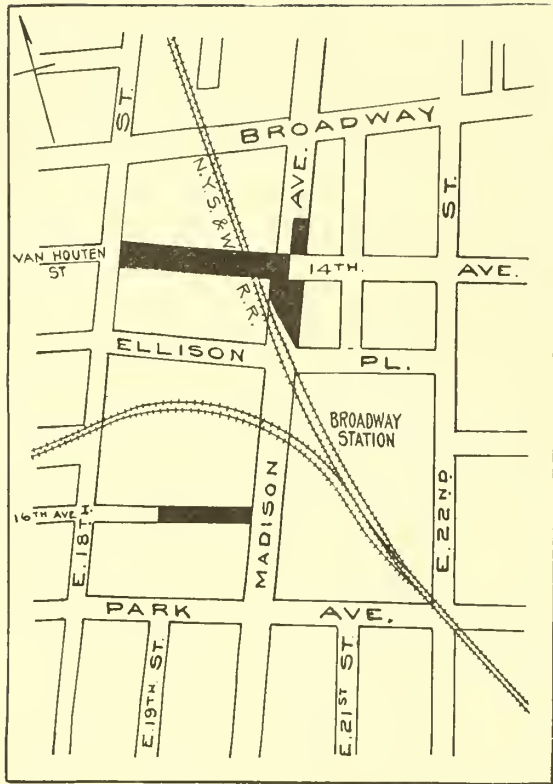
Madison Avenue extension. Van Houten Street extension. 16th Avenue Extension.
